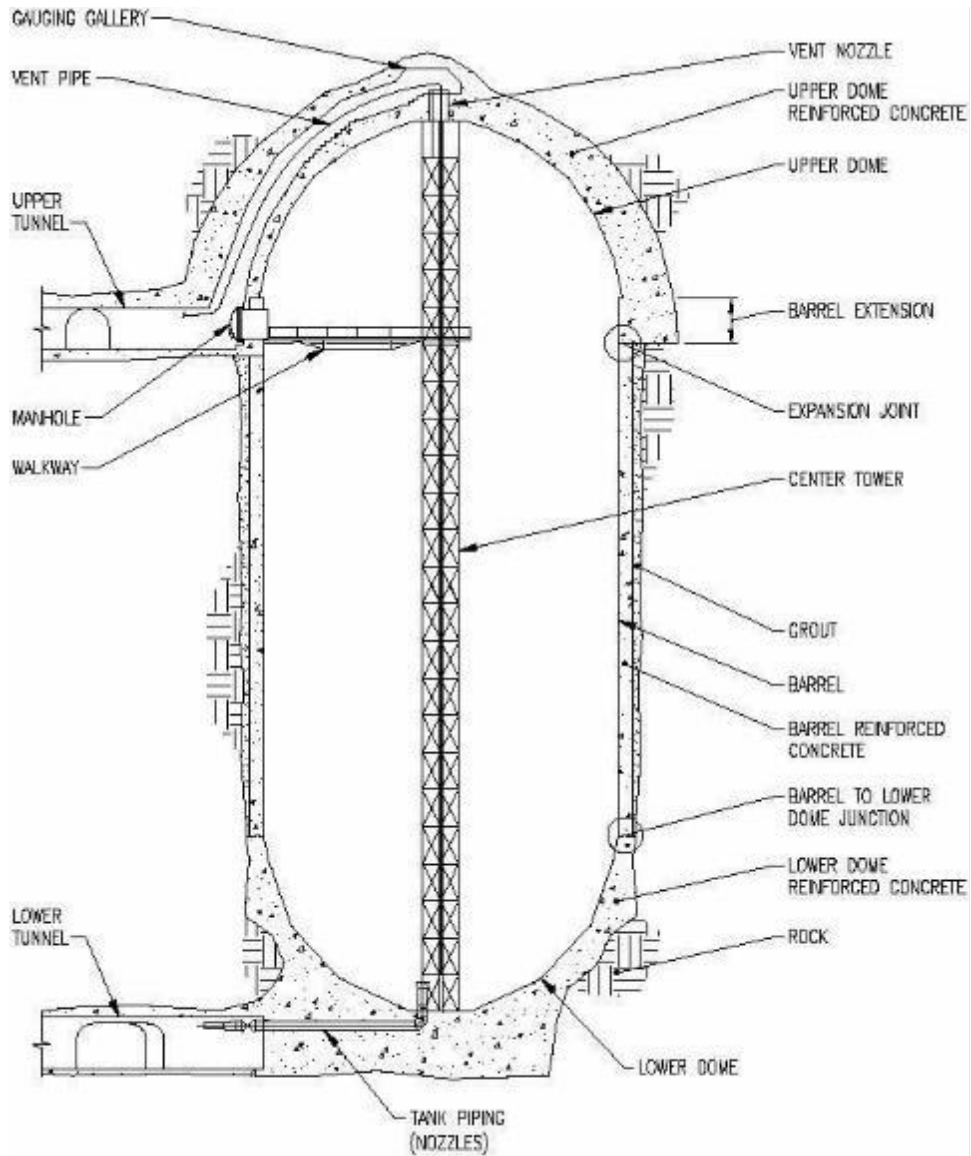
EXISTING TANKS 5-20 ELEVATION
